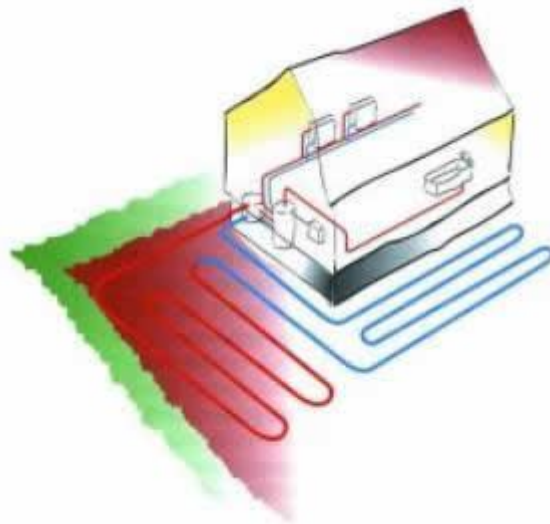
Ground coupled heat pump with horizontal pipe installation (SULPU)
